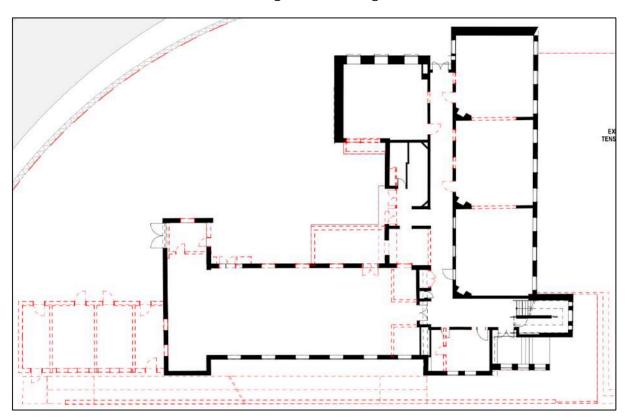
Fort Street School Building (A) Ground Floor Demolition Plan (Source: FJMT DA-2101, SSDA01, 18.12.19)
